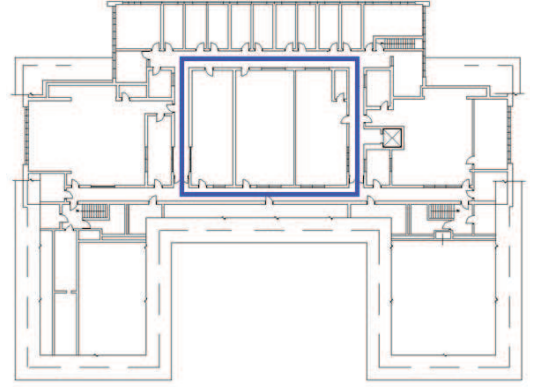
2D floor layout for Atwater Kent building, WPI.
